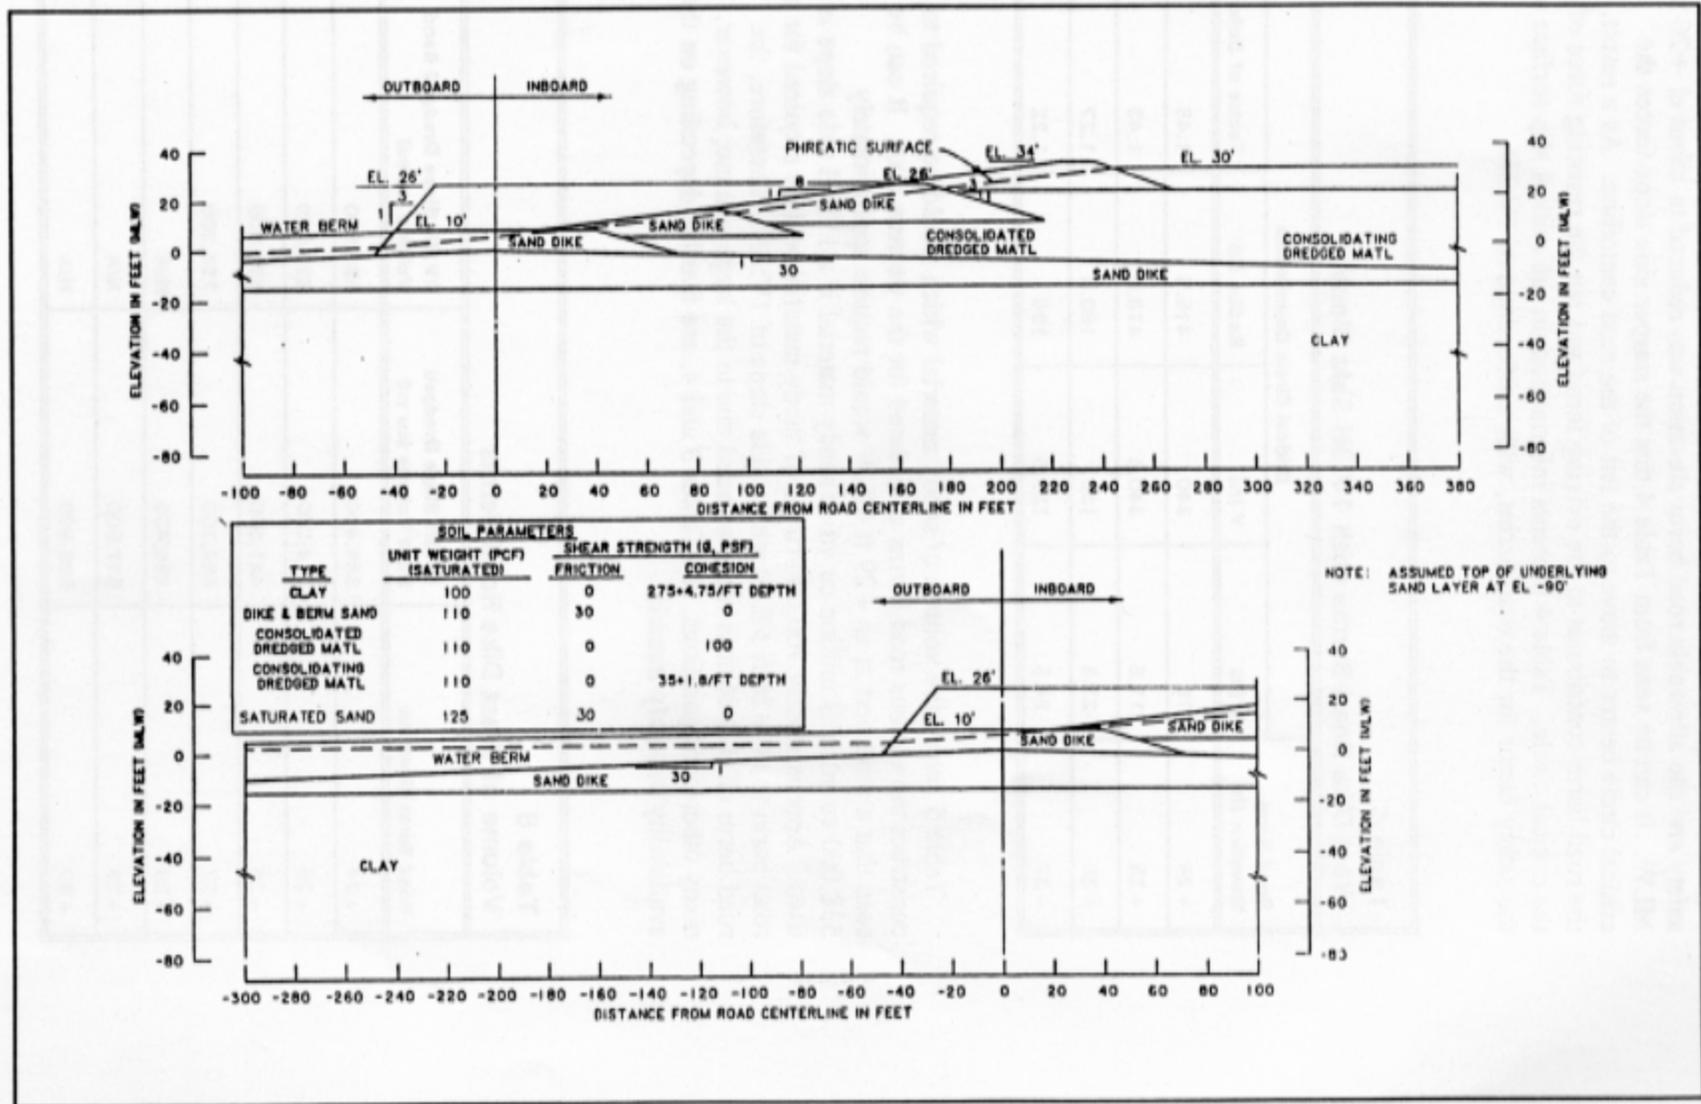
A. West perimeter dike cross-section with road berm addition (1V:3H slope)
